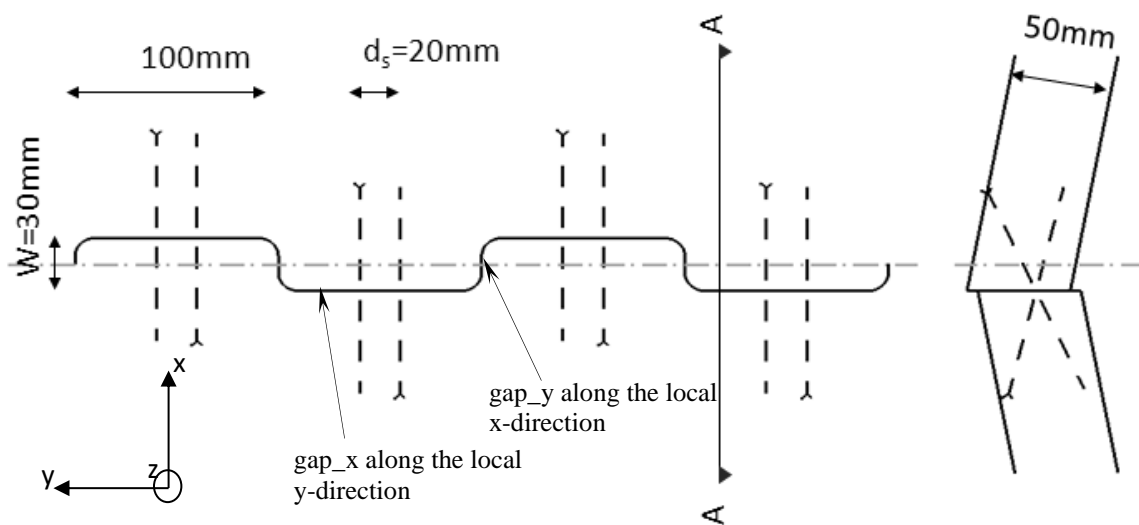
Left: Top view of a connection; a connection consists of numbers of finger joints and crossing screw joints in its local coordinates. Right: Section view AA.
